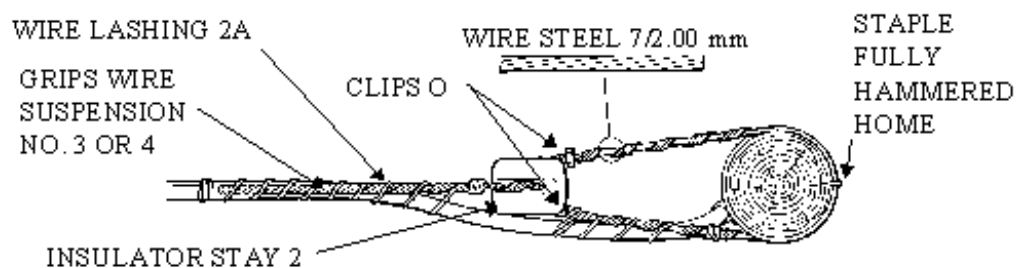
Aerial Cable Lashed to Grip following installation of Insulator Stay 2
